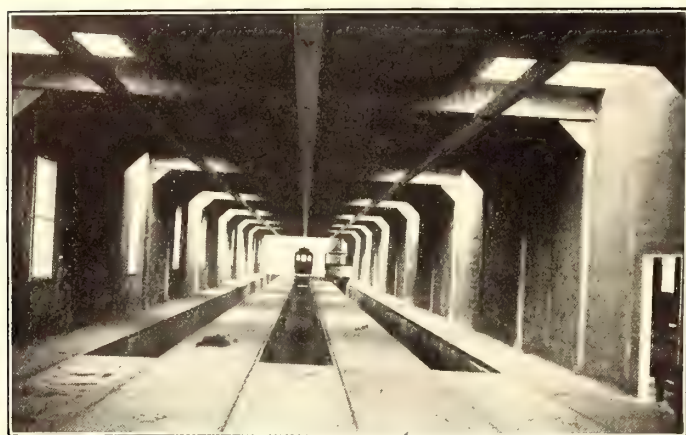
INTERIOR OF COMPLETED CONCRETE CAR HOUSE
